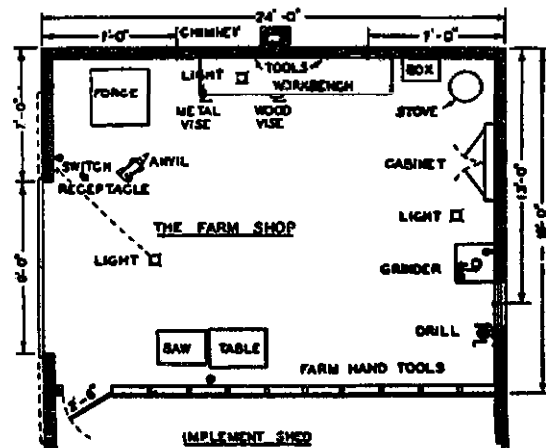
Floor Plan for Shop in End of Machinery Shed. (See your County Agent for complete Plan, No. 5595, which contains bill of material and similar arrangement.)
